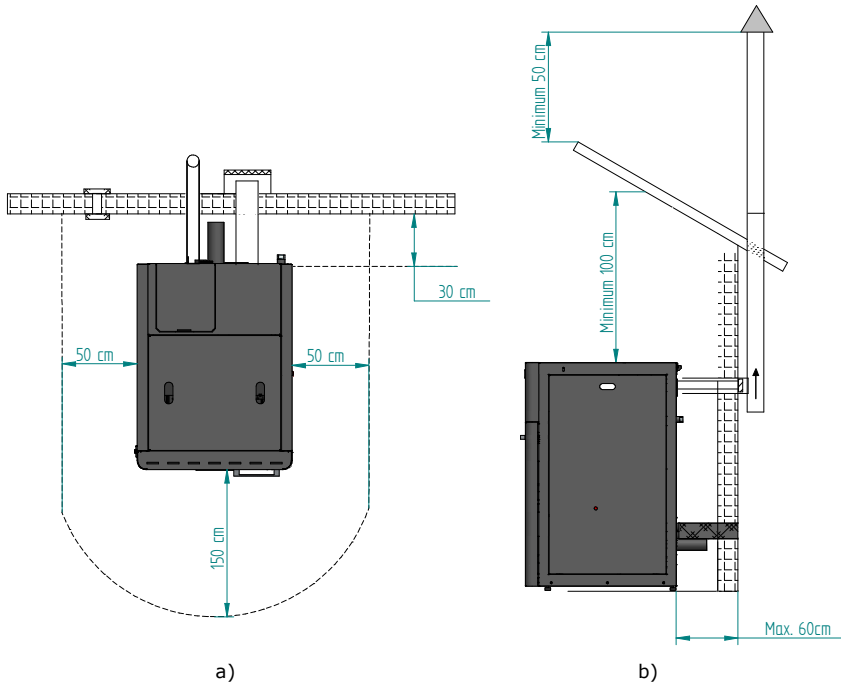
Minimum distances from all surfaces: a) upper view of the unit's installation; b) side view of the unit's installation
